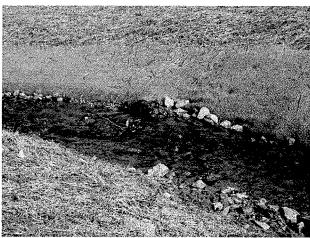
Looking downstream at rock J vane installed at MC Station 5+86 and log toe protection and root wads installed between MC Stations 6+20 and 6+55. (12/18/03)
